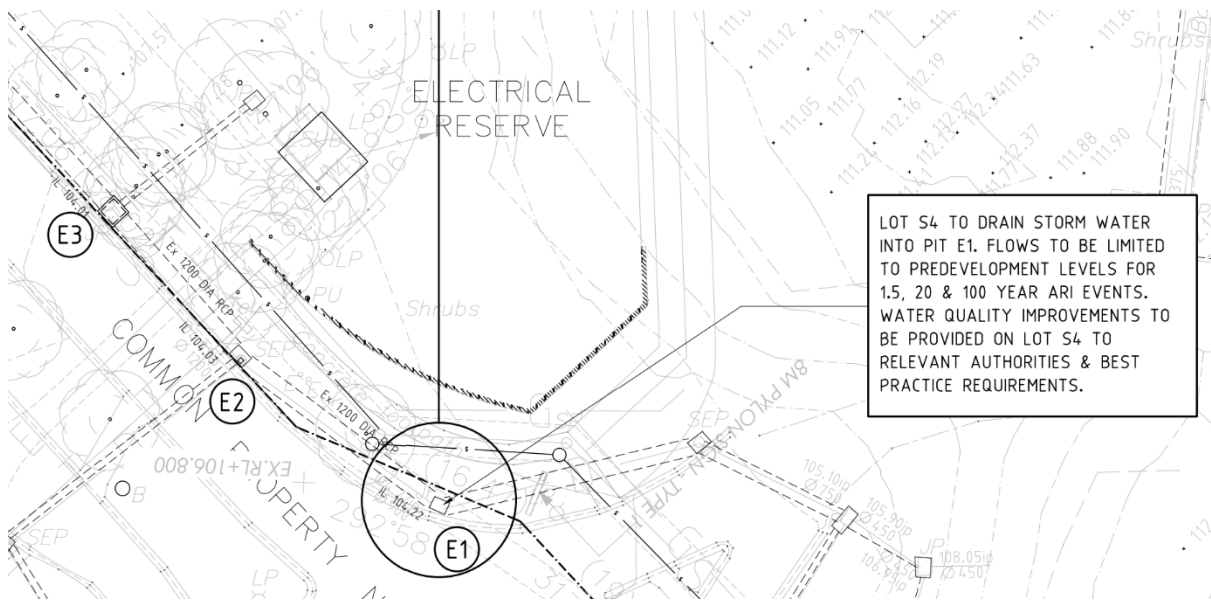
Extract from Davis, Naismith & McGovern (2018) showing proposed outlet connection from S4 at the roundabout junction pit
